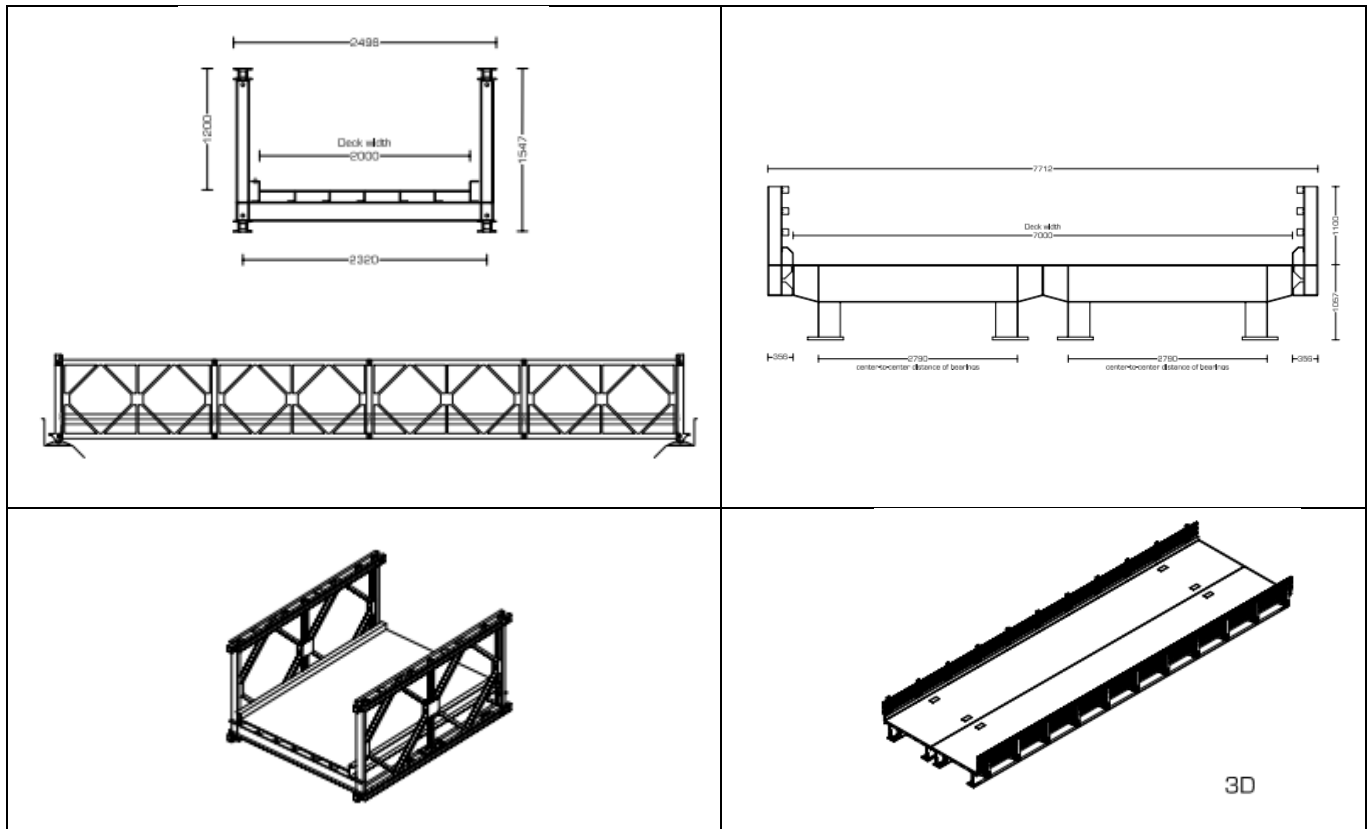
Figure 6: Janson Bridging modular girder bridges whose length (left pictures) and width (right pictures) can be extended by adding more identical modules (Janson Bridging, 2011)
